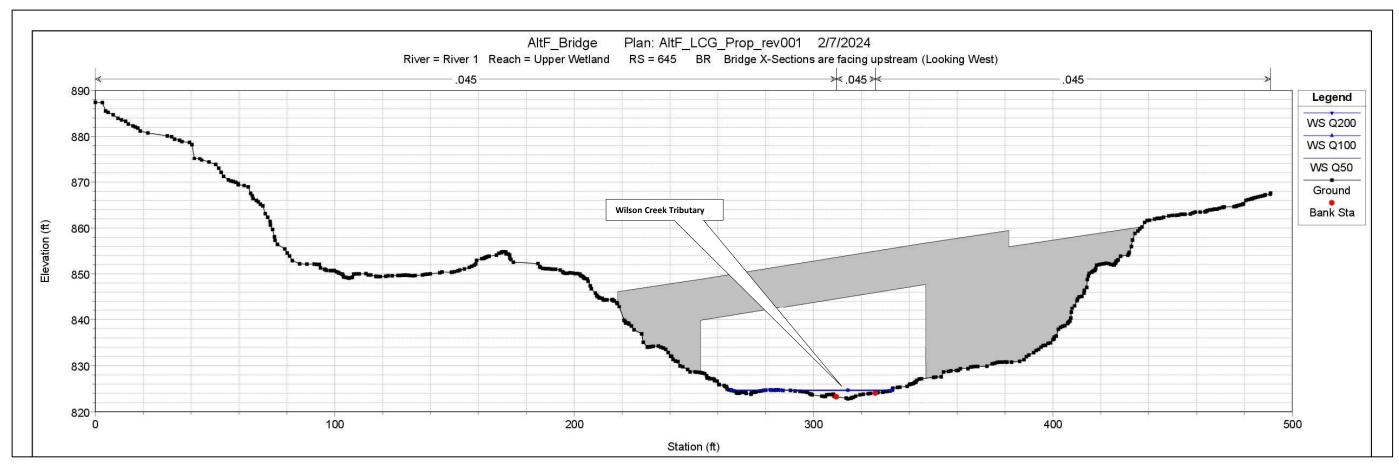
Downstream Face of Alternative F Bridge, Looking Upstream
